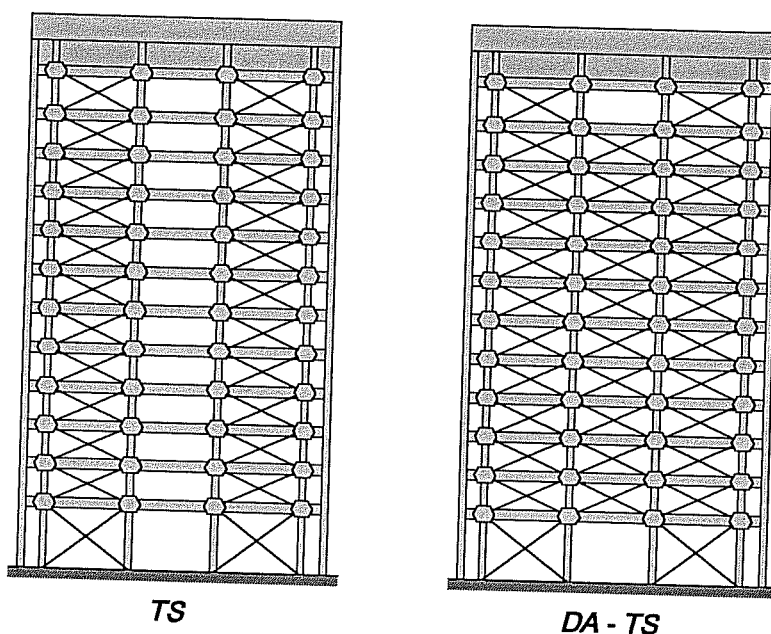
Bracing configurations for concentrically braced building with structural steel braces. (perimeter frames only)
